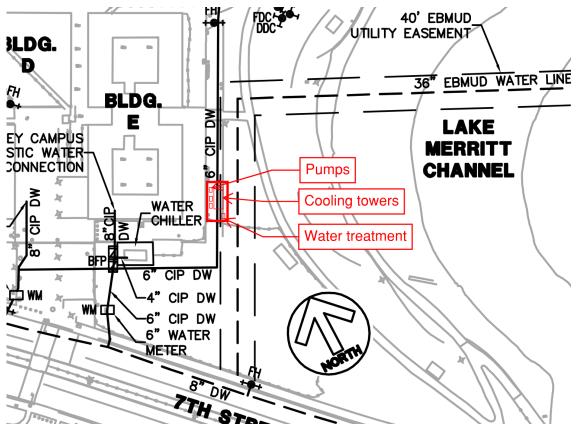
Plan view of potential cooling tower adjacent to Building E. Location 5.
